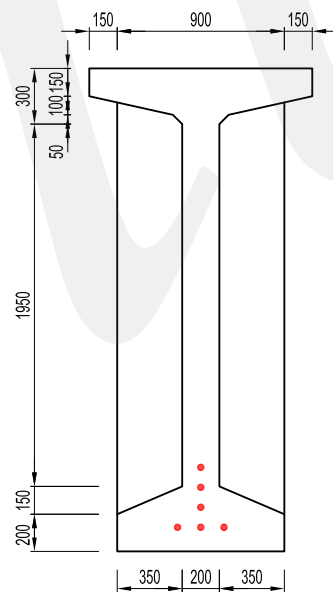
Cross-section dimensions of precast concrete girder. All dimensions are in centimeters. 1 cm = 0.3937 in.
